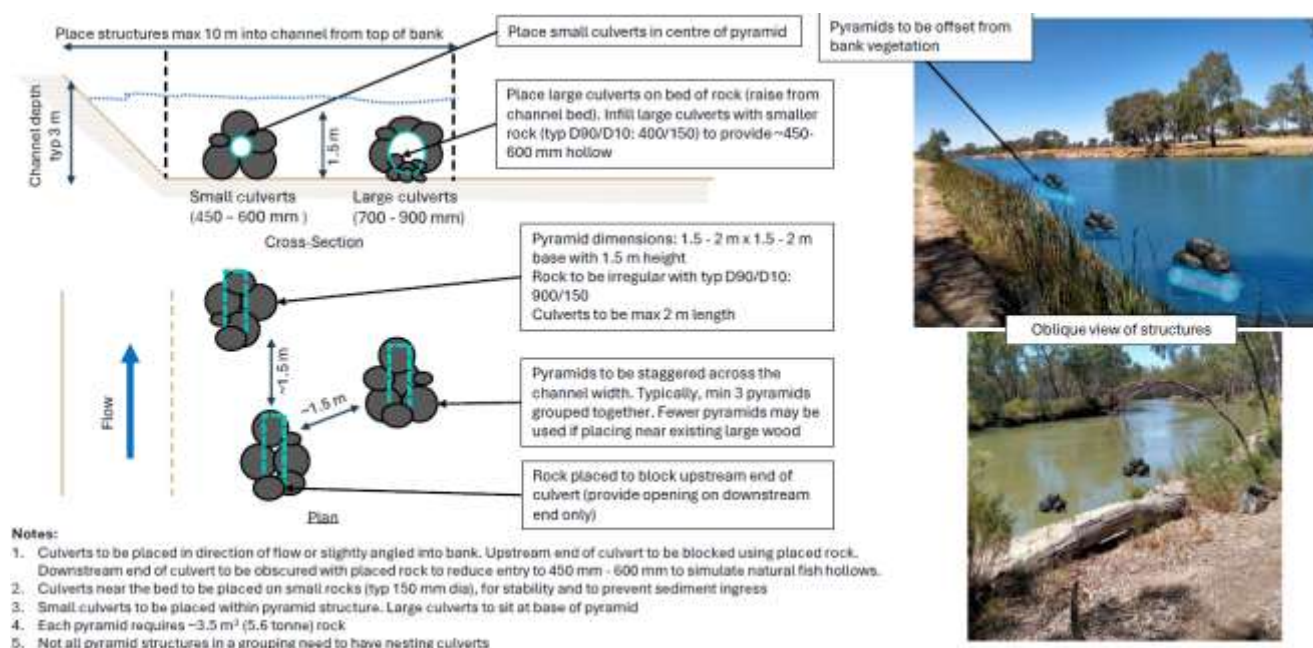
Concept design of rock pyramid structure with nesting culvert – showing plan view and typical section. Dashed lines indicate outline of nesting culverts situated beneath rock
